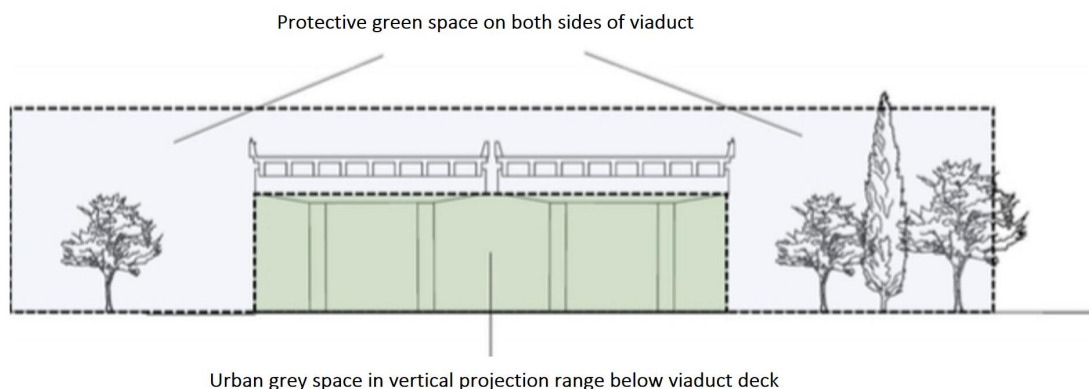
Space under an viaduct and surrounding space (drawn by the author)
